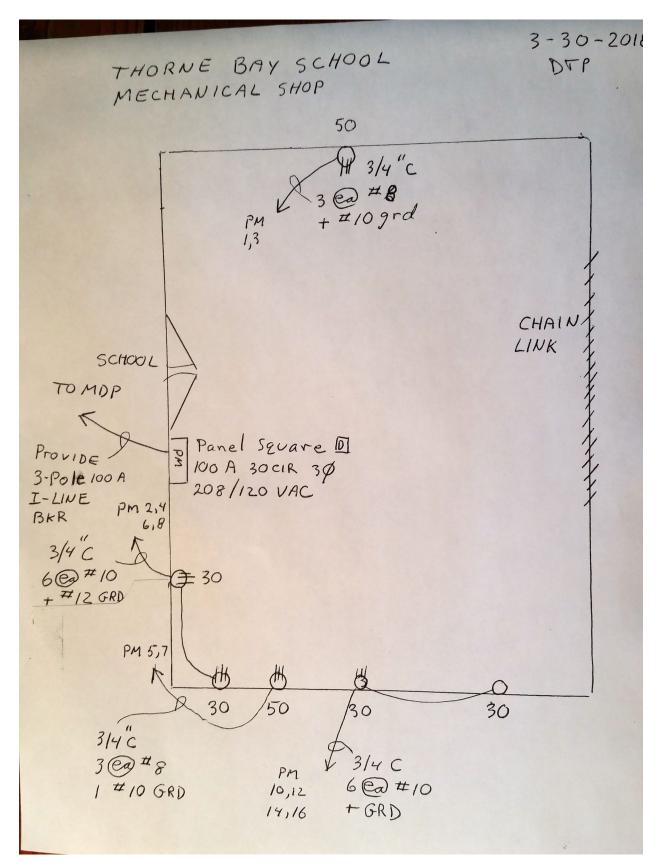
Thorne Bay School Mechanical Shop Electrical Drawing
